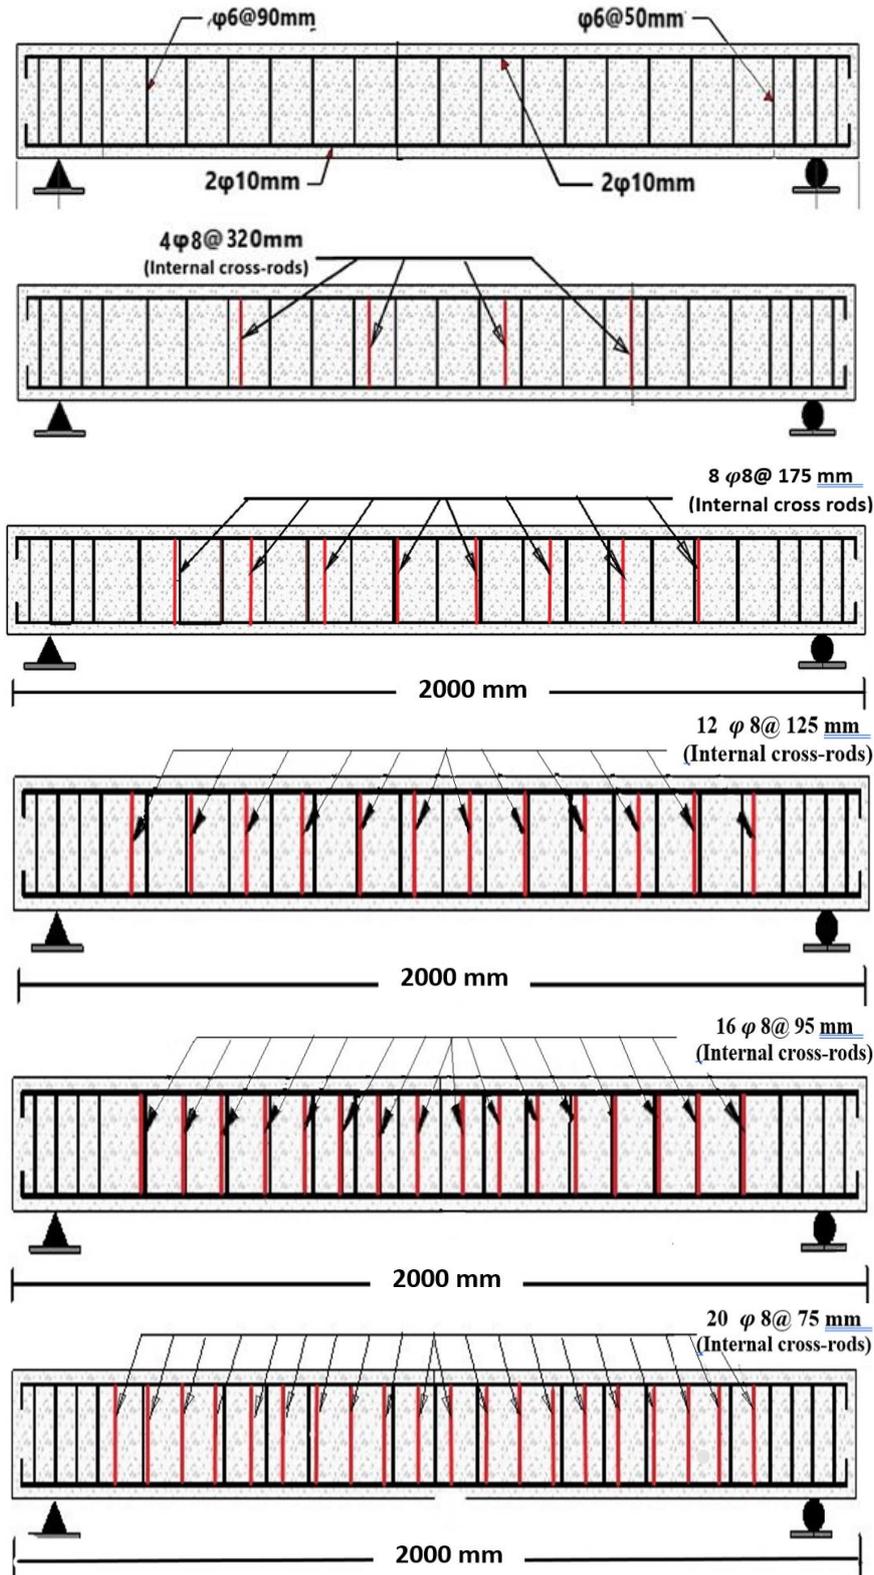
Reinforcement and distribution of internally cross-rod for concrete beams in each of the three concrete groups
